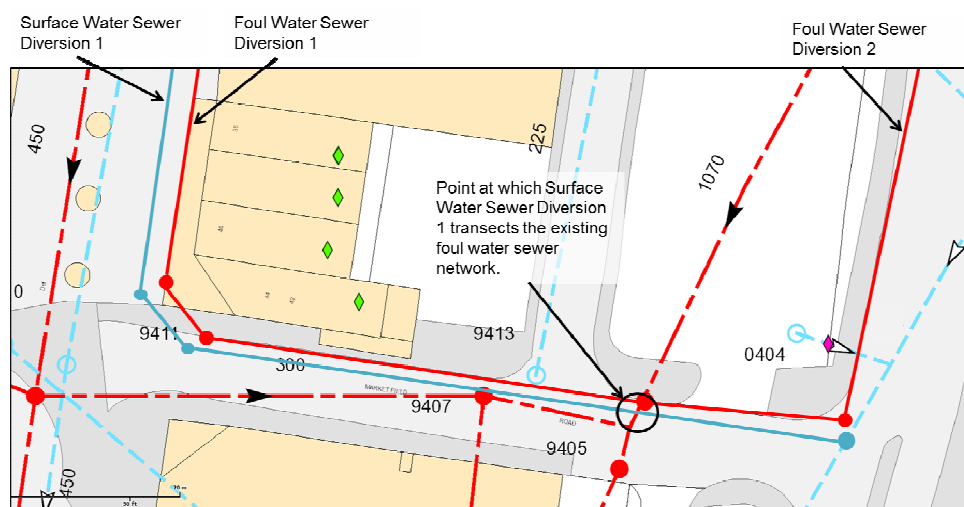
The location where Surface Water Diversion 1 transects the connection sewer of Foul Water Diversion 1 and Foul Water Diversion 2.
